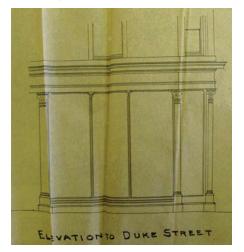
(left) Elevation of 79 Duke Street as proposed in 1873 (CRO(B) 460 1873)
